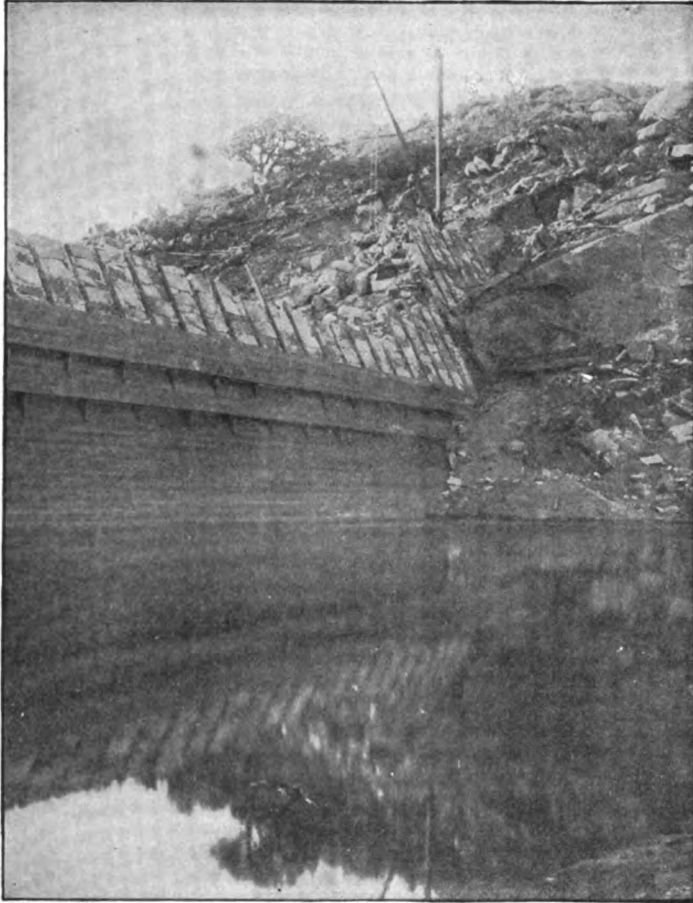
CONSTRUCTION OF FACING OF ESCONDIDO DAM.
